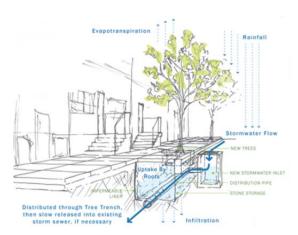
Typical, Stormwater tree trench conceptual diagram
